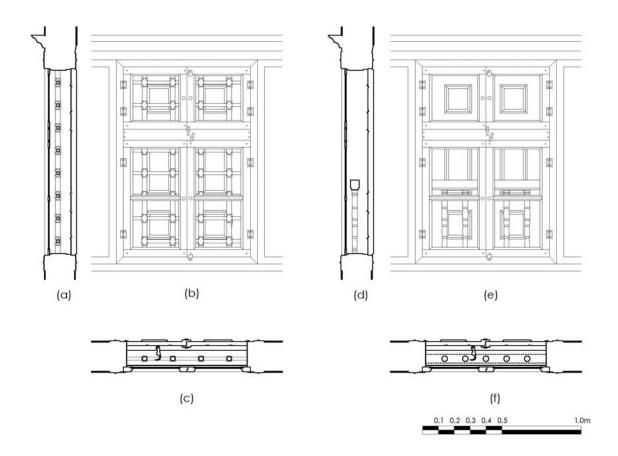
Rectangular window section with full rain (a), view (b), plan (c), Rectangular window section of half-rain (d), View (e), Plan (f)
